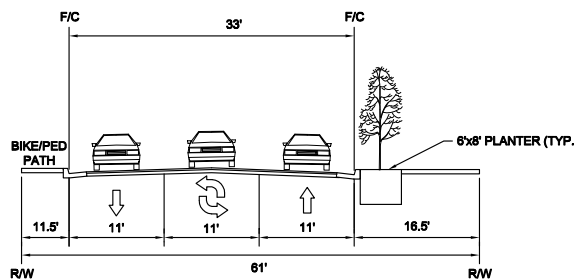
Bercut Drive Between Camille Lane and South Park Street (looking north)
